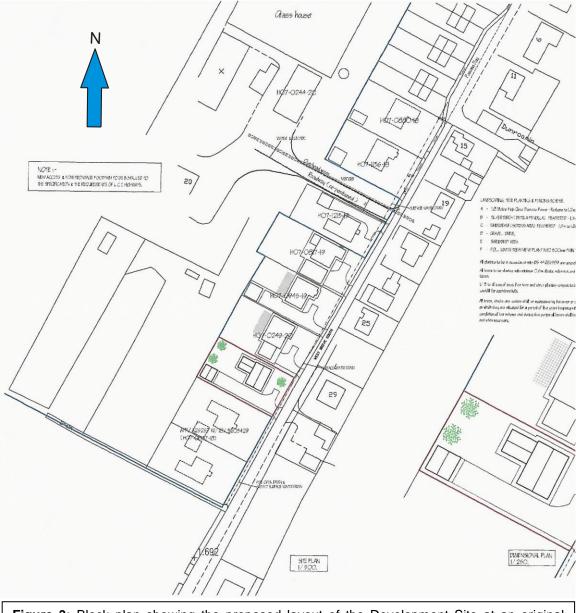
Block plan showing the proposed layout of the Development Site at an original scale of 1:500, (not to scale), (extract from Architects plan).
